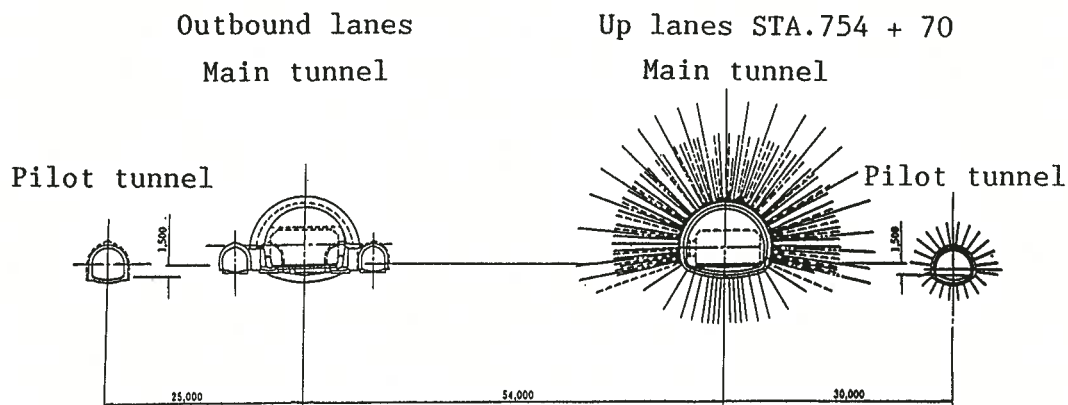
Layout of second tunnel and first tunnel of Choubeizawa fault
